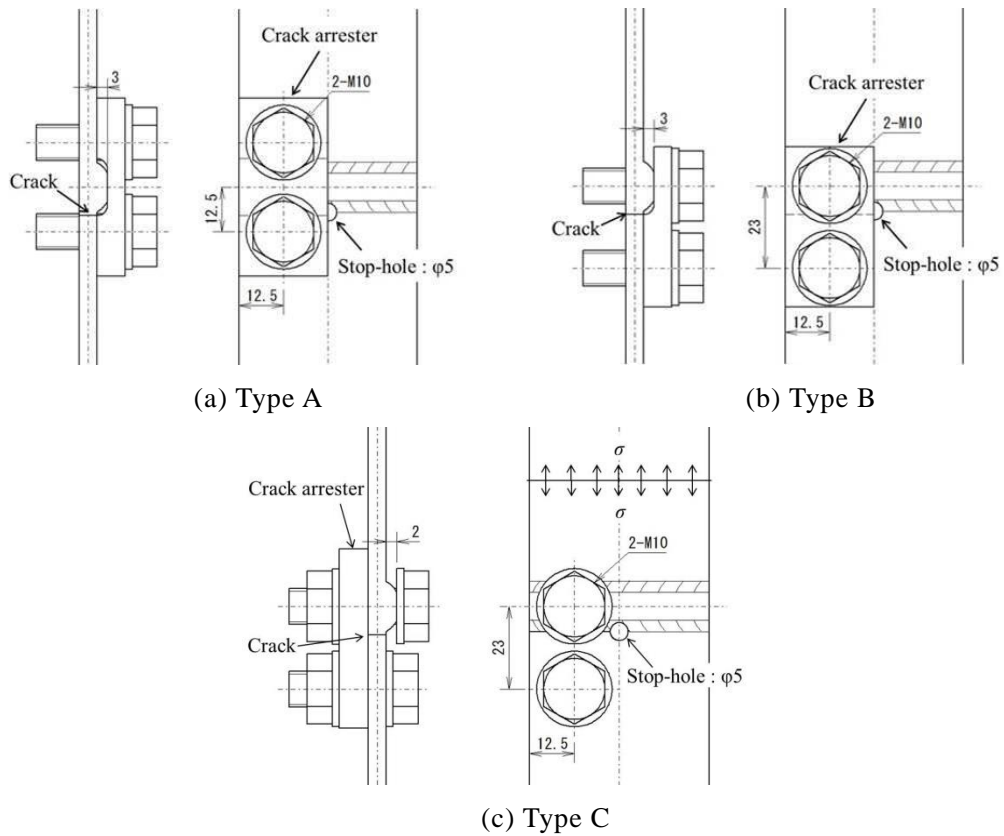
Application patterns of a stop-hole and crack arrester to welded specimen (mm).
